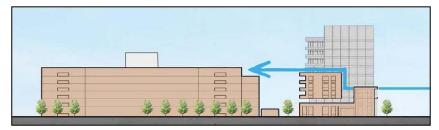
Storey Apartment Building and 65 Port Street - applicant's rendering
